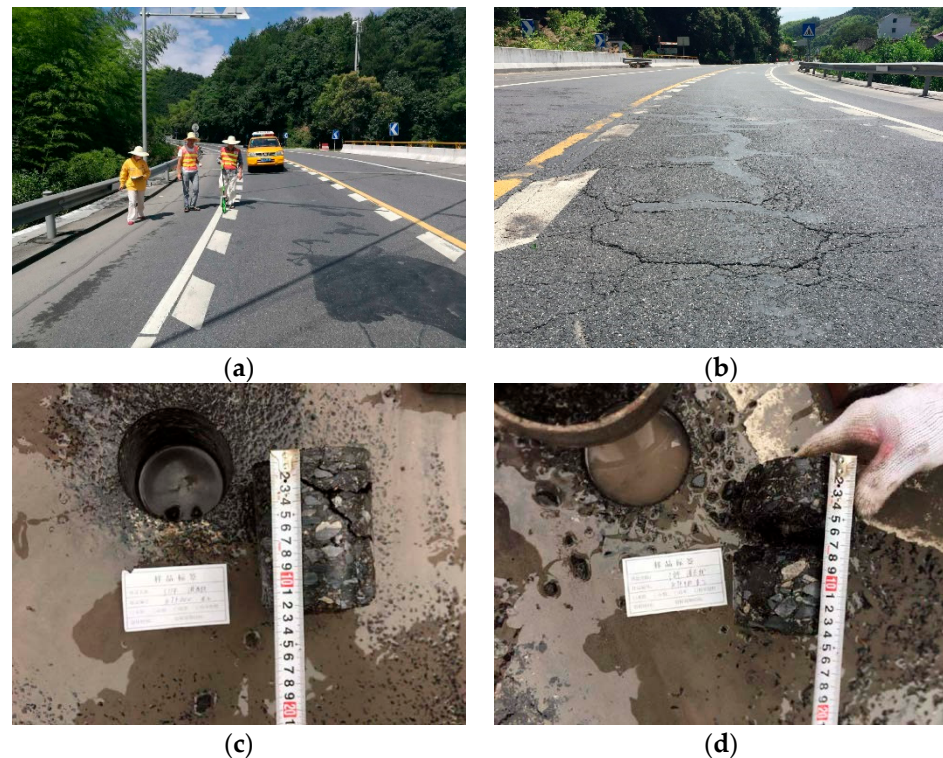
(a) Pavement testing by inspection van, (b) pavement damage conditions, (c) the core sample of left-pavement, and (d) the core sample of right-pavement.
